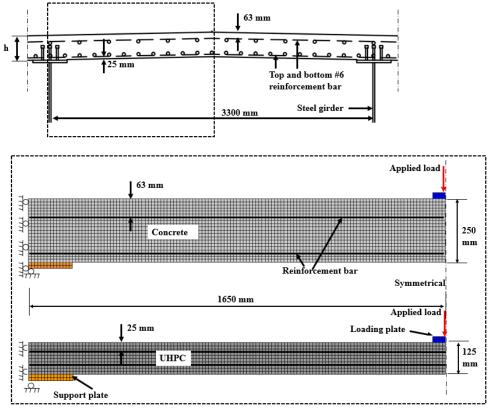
Cross section of a reinforced concrete bridge deck and the modeling set up. The unit can be converted as 1 inch =25.4 mm.
